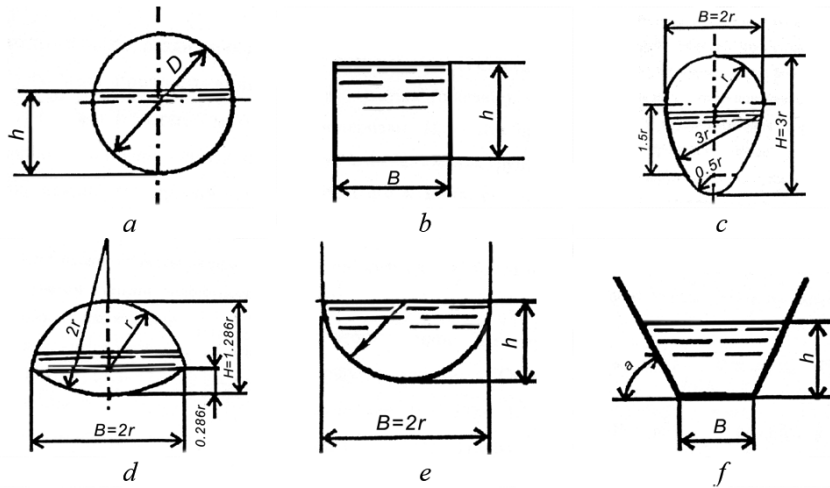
The cross-sectional area of sewer pipelines and sewers: (a) round; (b) rectangular; (c) ovoid or oval; (d) invert-type; (e) semicircular; (f) trapezoidal [21, 205]
